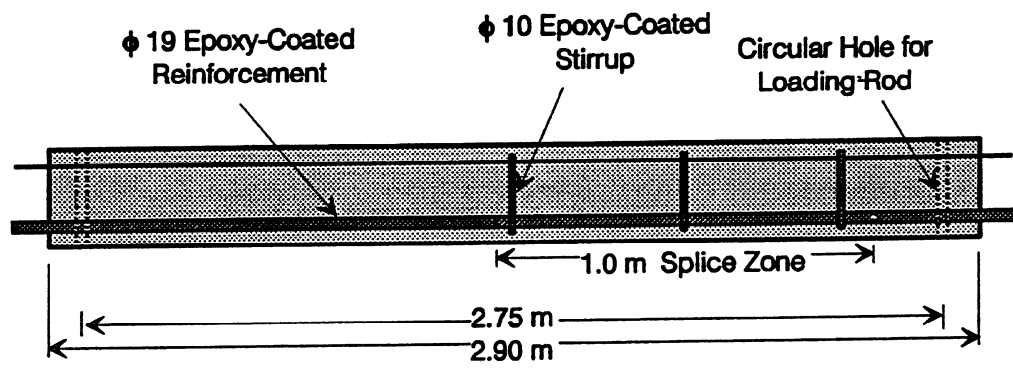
Details of Group III Beam Specimen (All Bars).
